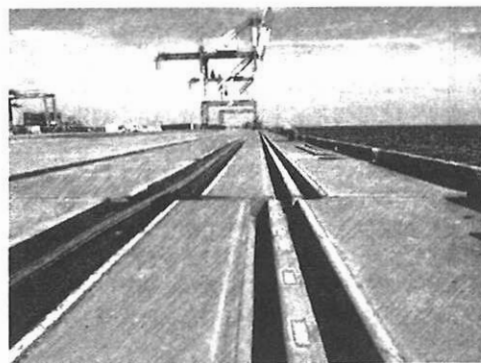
Quay wall deformation and misalignment of the gantry crane rail
